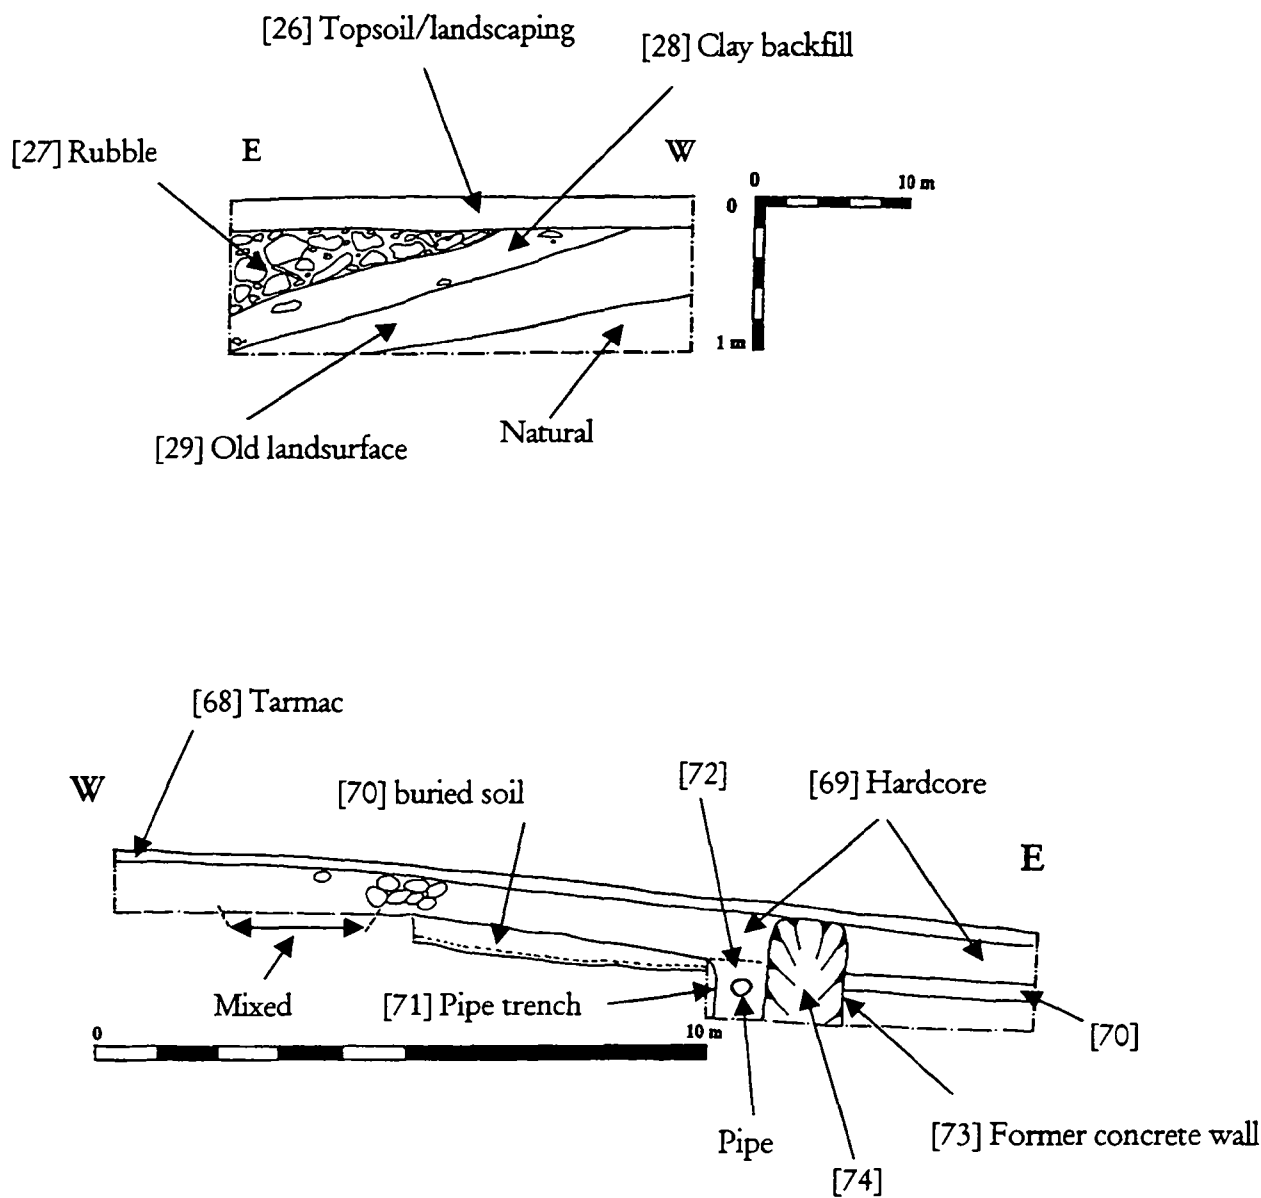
Section through part of the gabion west foundation trench (top), and section through part of the gabion south foundation trench.
